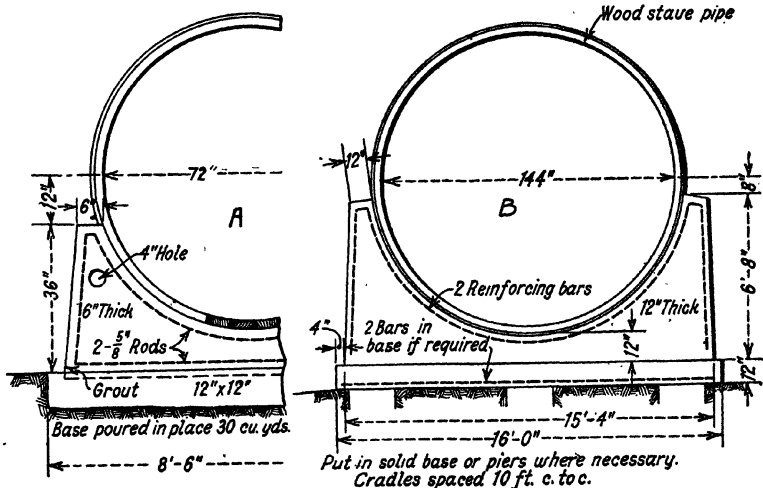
Typical Concrete Saddles. A—Pre-cast Cradle. B—Cradle Poured in Place. Continental Pipe Mfg. Co.
